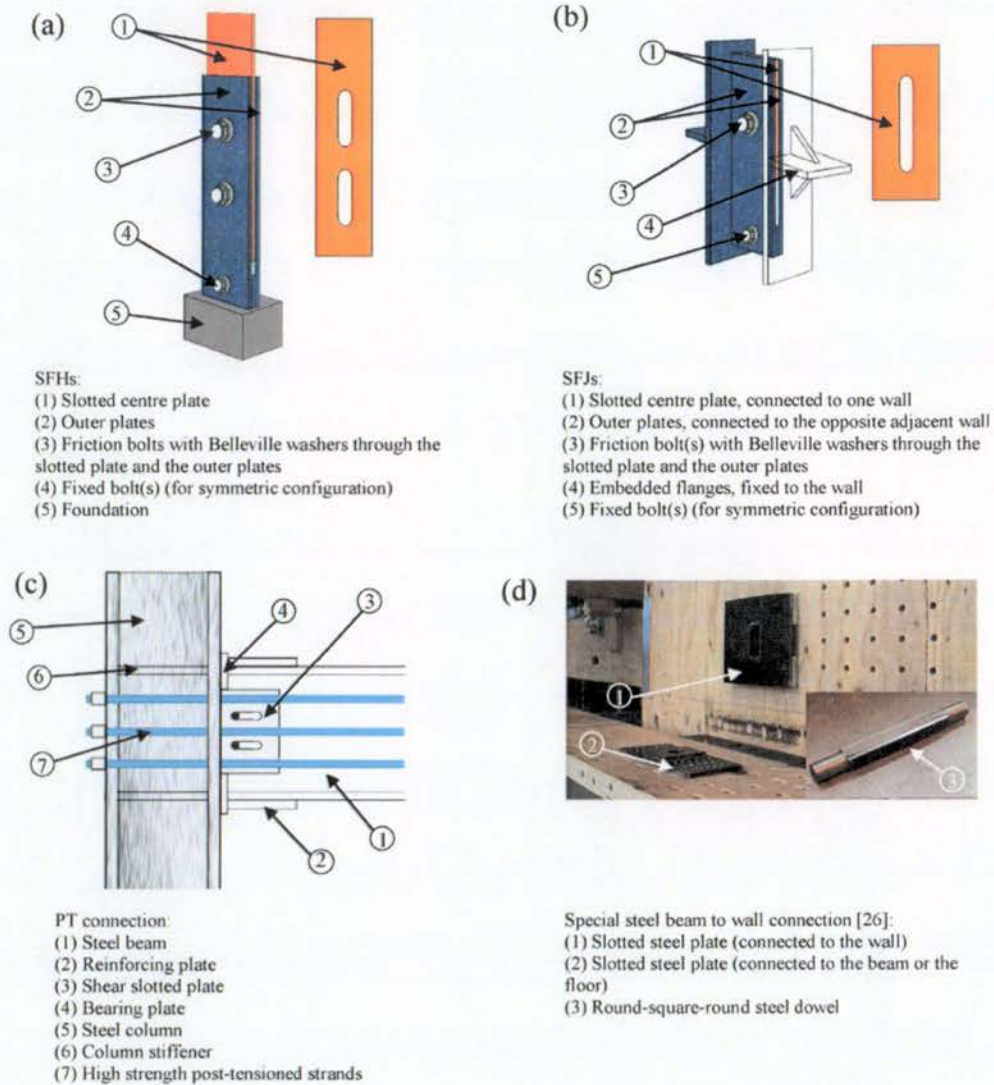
The components of the SC-RW system: a) slip friction hold-down (SFH) b) slip friction joint (SFJ) c) beam to column post-tensioned connection d) steel beam to wall connection.
